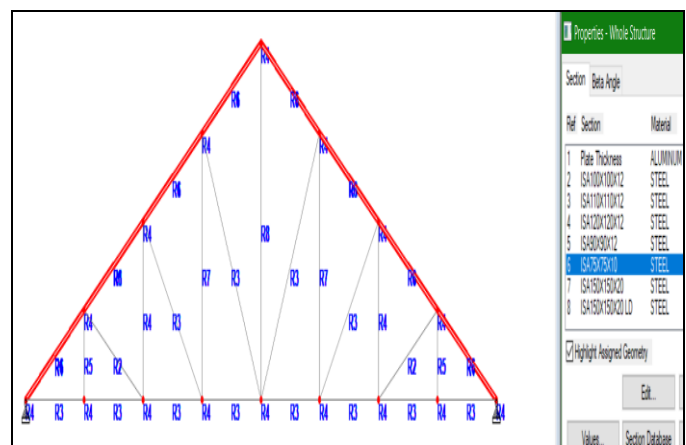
Property of Steel ISA 75 X 75 X 10 mm provided for above red colored Member of Steel Truss.
